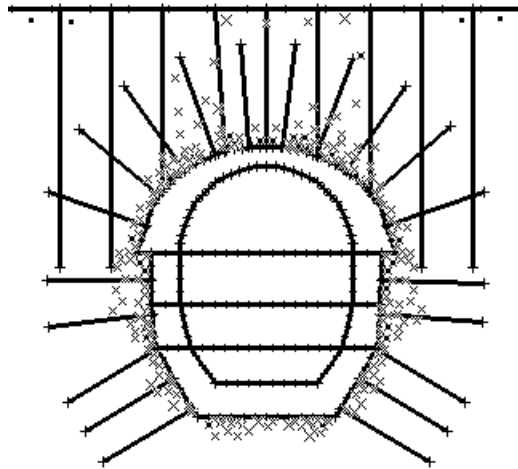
Extent of yield in the rock mass surrounding the complete spillway tunnel excavation before placement of the concrete lining.
